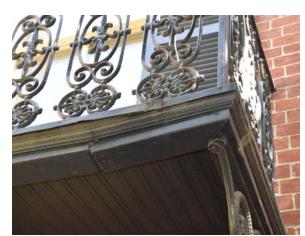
[Top Right] Deteriorated finish at wood cornice of north porch. [BBB, 2024]
